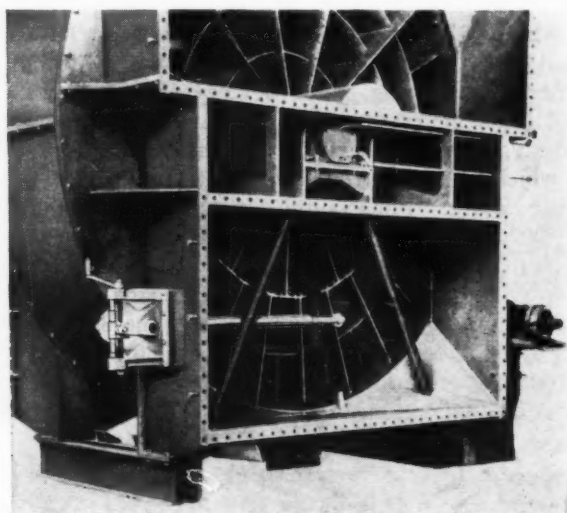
Typical arrangement of manually operated single-nozzle cleaning device installed in air inlet of a horizontal air preheater
